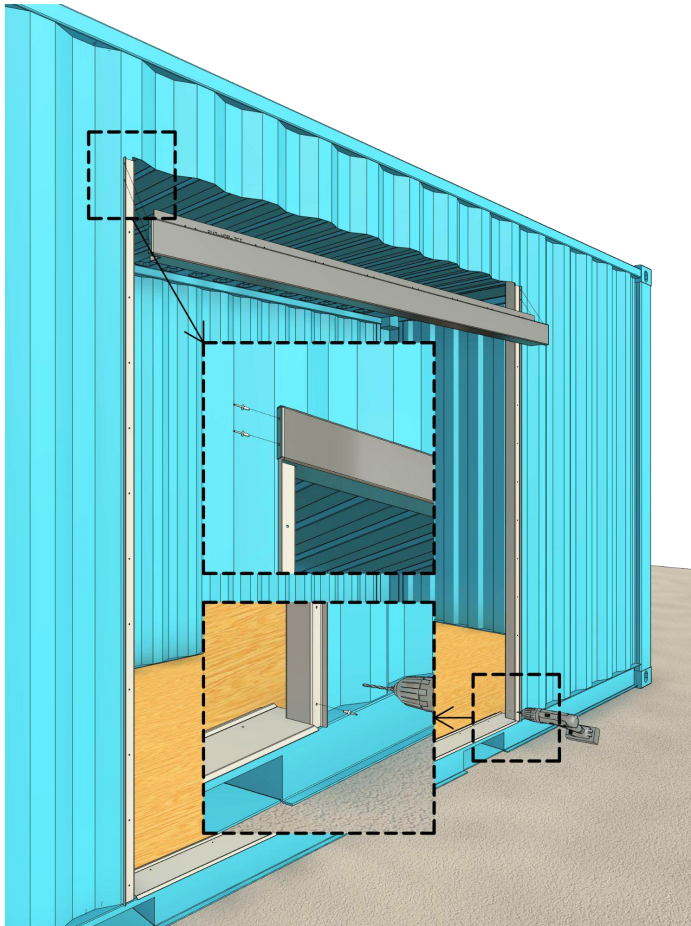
RUD Fastening Bottoms of Side Pieces & Header Placement
